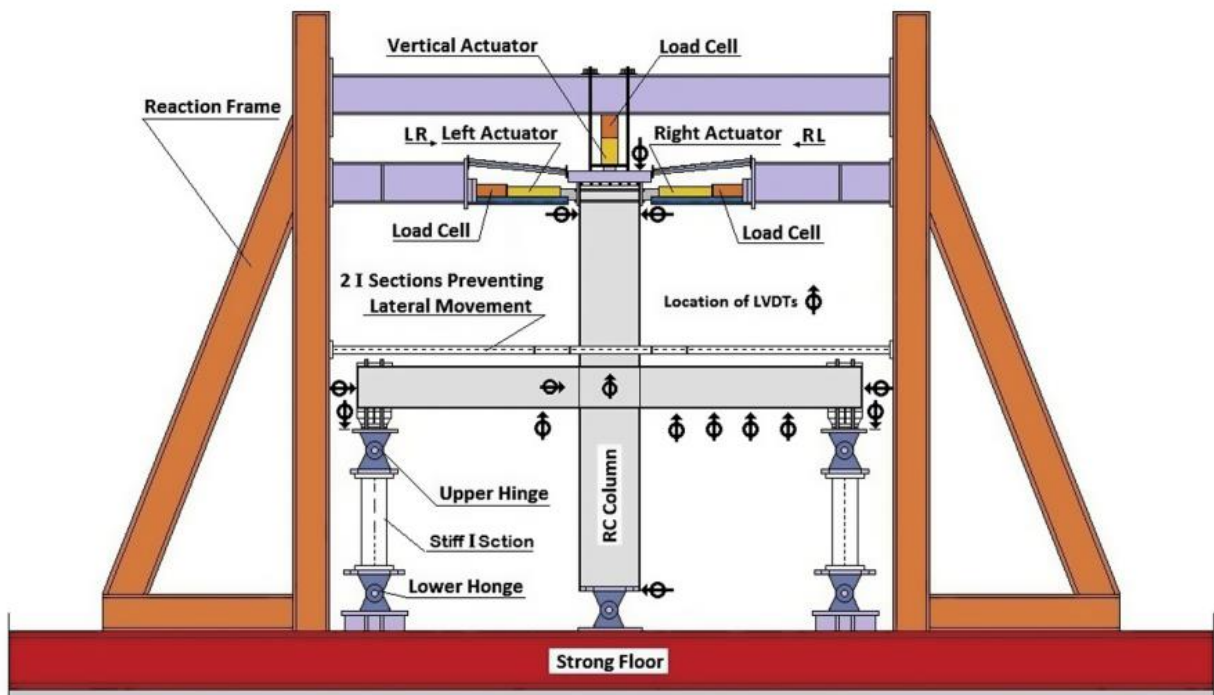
Schematic test setups for the interior and exterior test specimens
